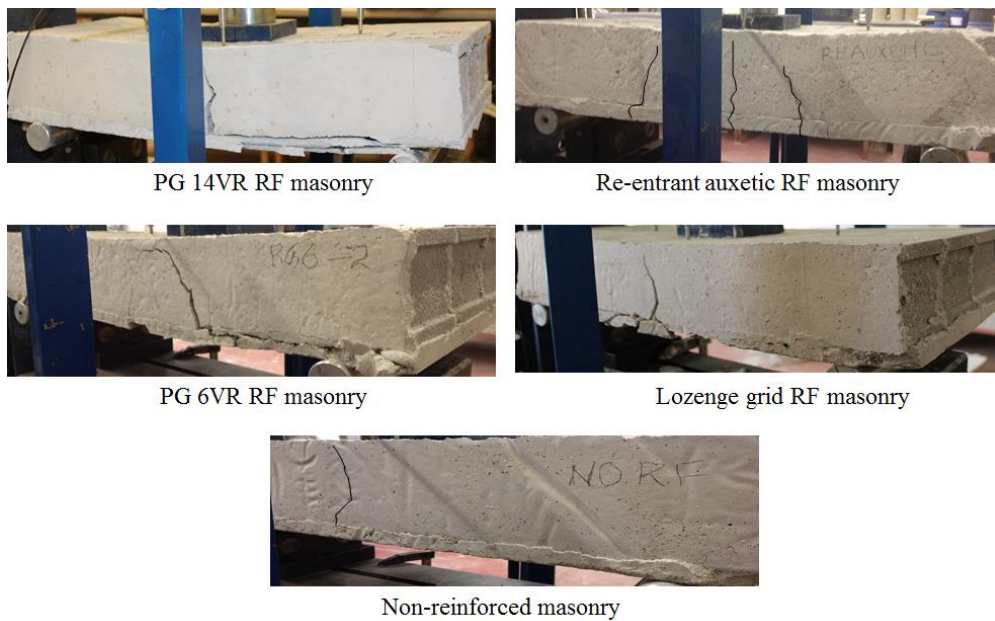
Failure mode of non-reinforced and structures reinforced masonry specimens.
